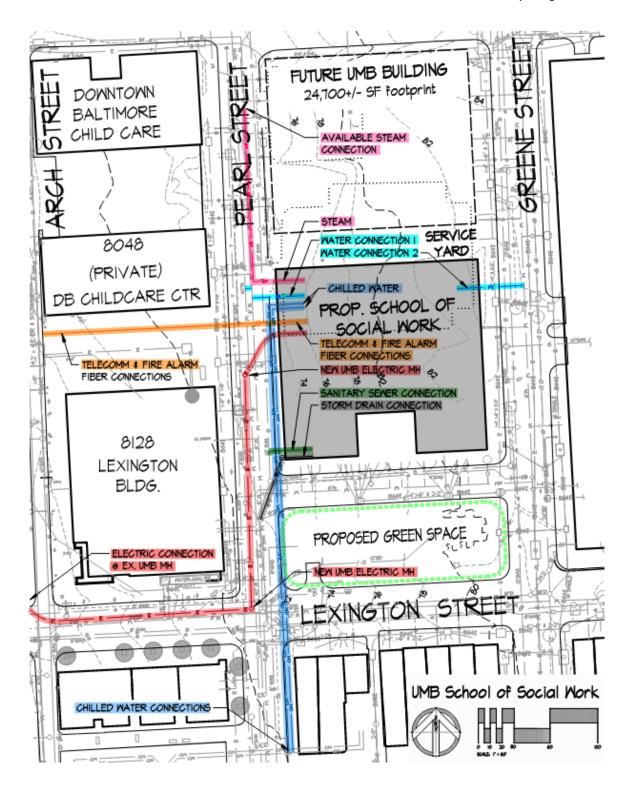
Proposed Site Utilities. Offsite design work is involved to bring utilities to the building site.
